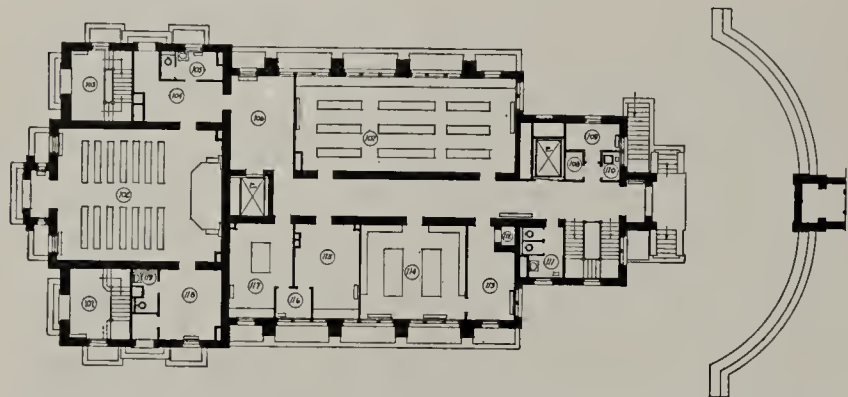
First-floor plan, pathologic building, New General Hospital, Cincinnati; schedule of rooms: 101, stair hall; 102, chapel; 103, stair hall; 104, lobby; 105, minister's robing-room; 106, undertaker's room; 107, laboratory; 108, closet; 110, slop-sink; 111, water-closet; 112, vault; 113, custodian's office; 114, reading-room; 115, chemical laboratory; 116, spectroscopy; 118, family retiring-room; 119, water-closet.
